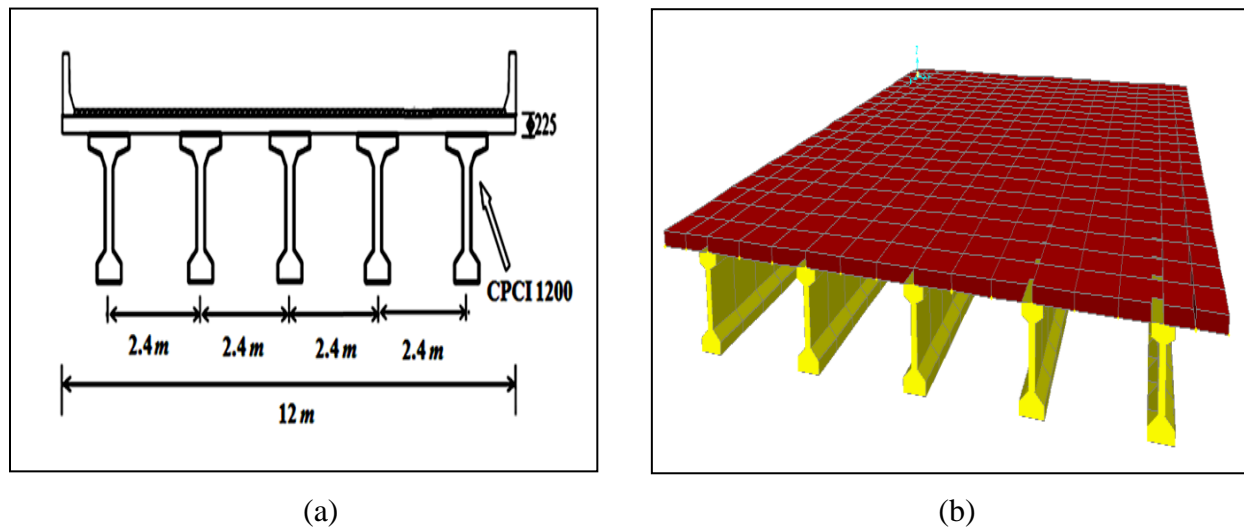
Schematic diagram of the prestressed bridge cross-section (a) 2-D, (b) 3-D.
